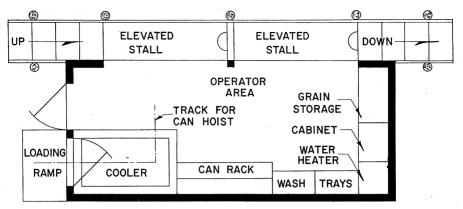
Shown above is the floor plan of the low-cost milking parlor built as a separate structure.
